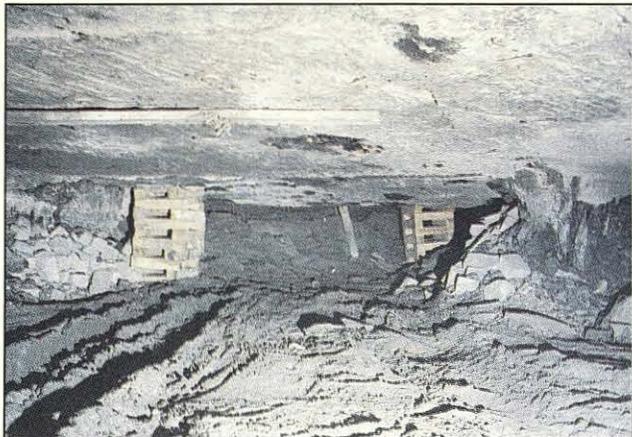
Good roof and floor conditions at tail shield following alteration of the gate design.
